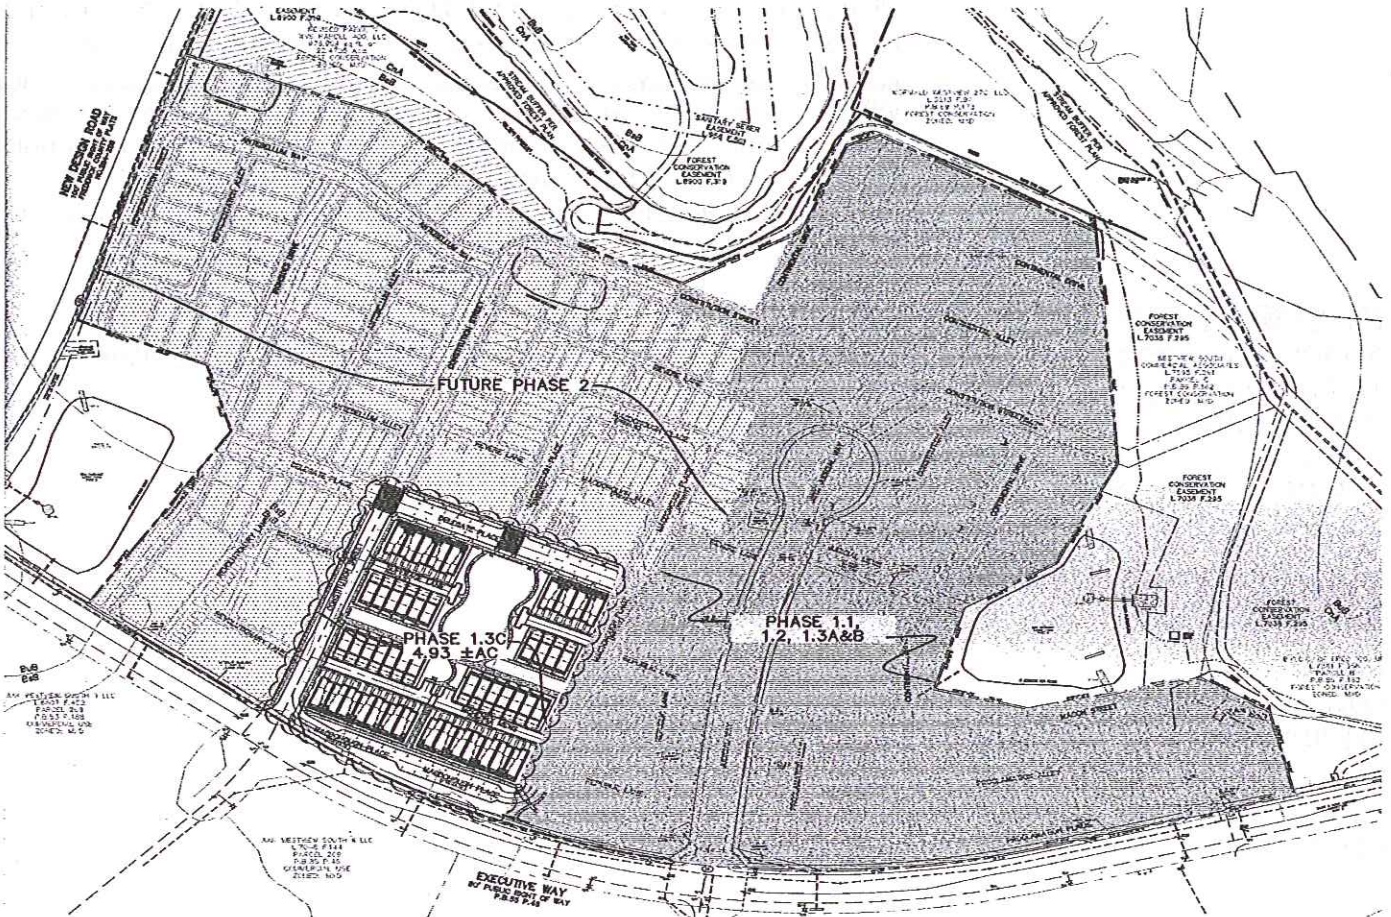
Plan Rendering (Overall Westview South Residential Plan w/ proposed Phase 1.3C highlighted)
